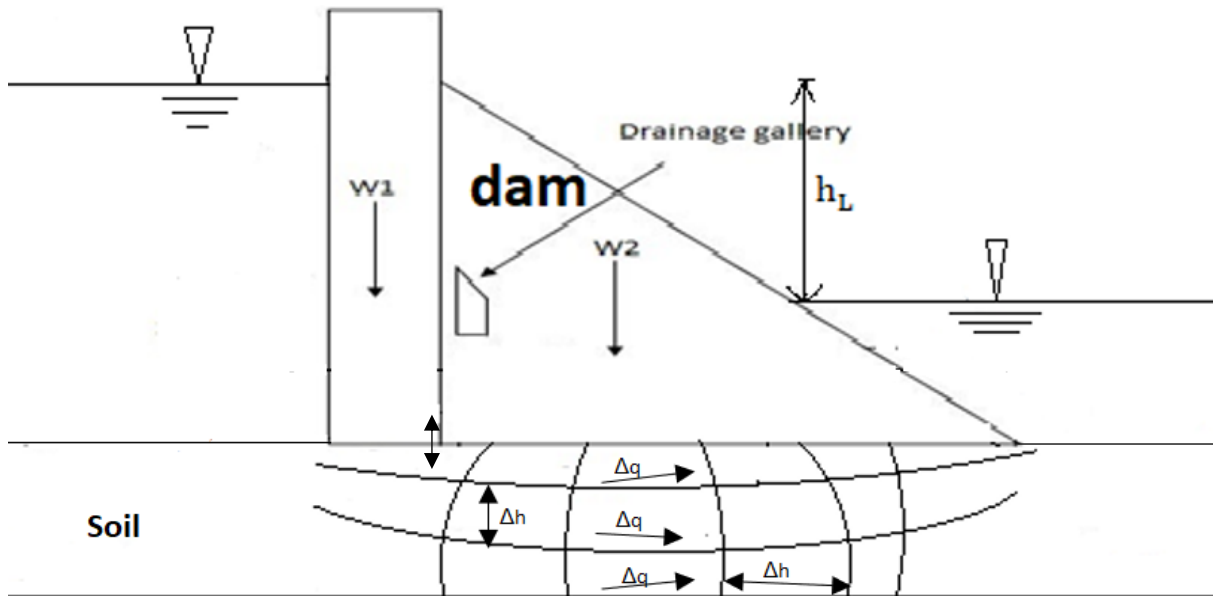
7: Seepage Beneath Concrete Gravity Dam
